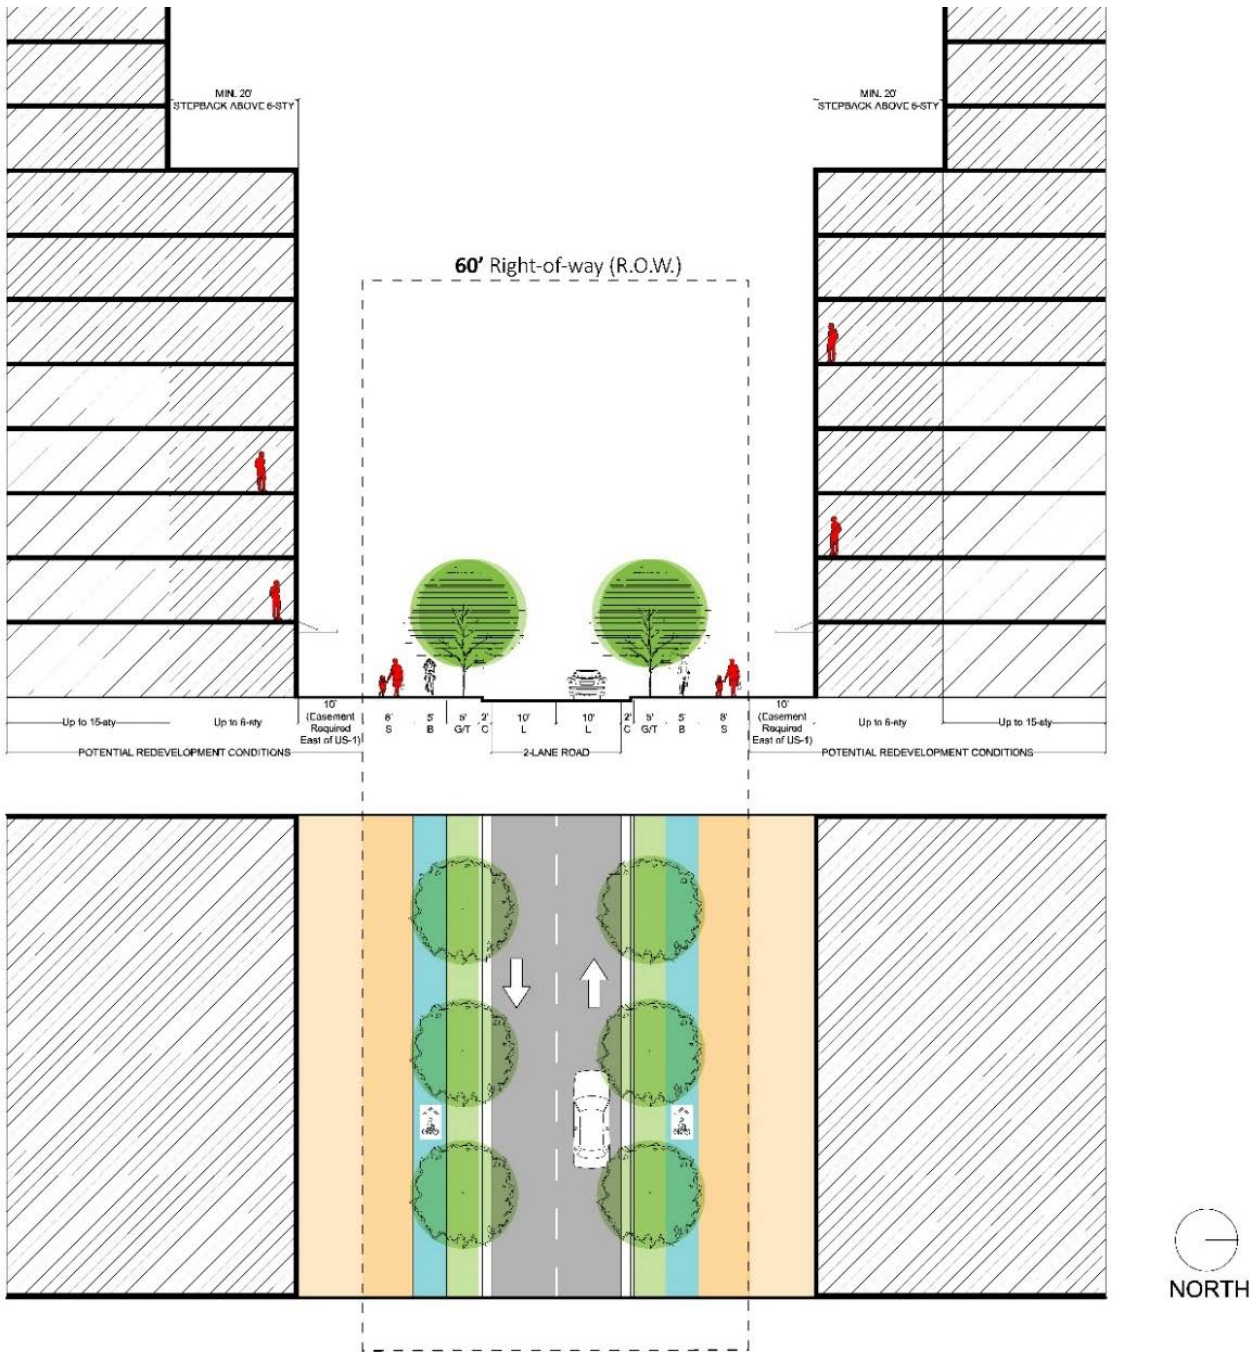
F.6: Secondary/Greenway Streets with No Parking Street Design
